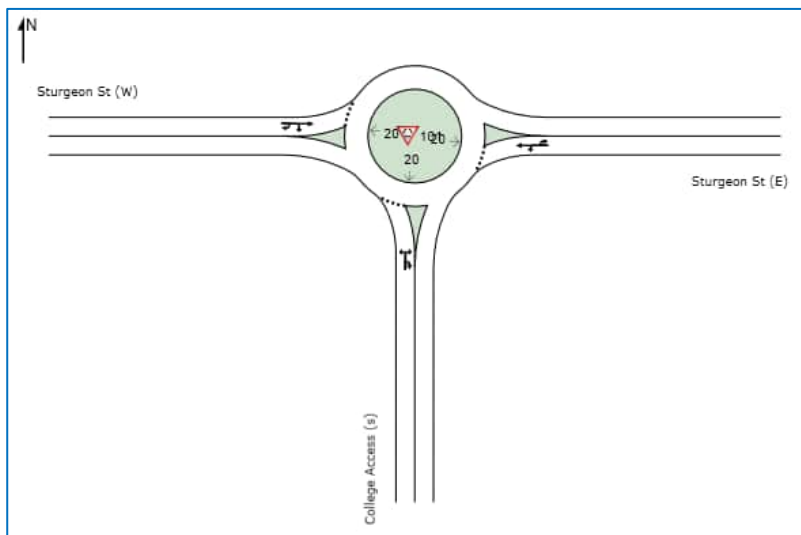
SIDRA Generated Layout of the Sturgeon Street/College Access Intersection.
